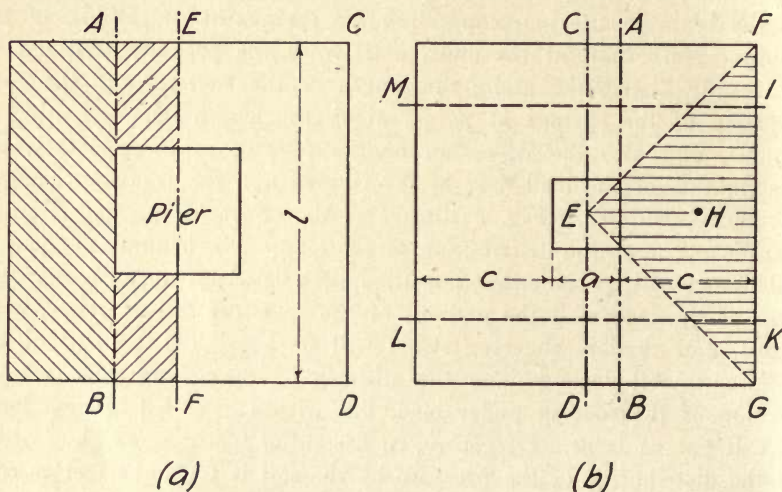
LOADED AREAS ASSUMED IN DESIGNING COLUMN FOOTINGS.
